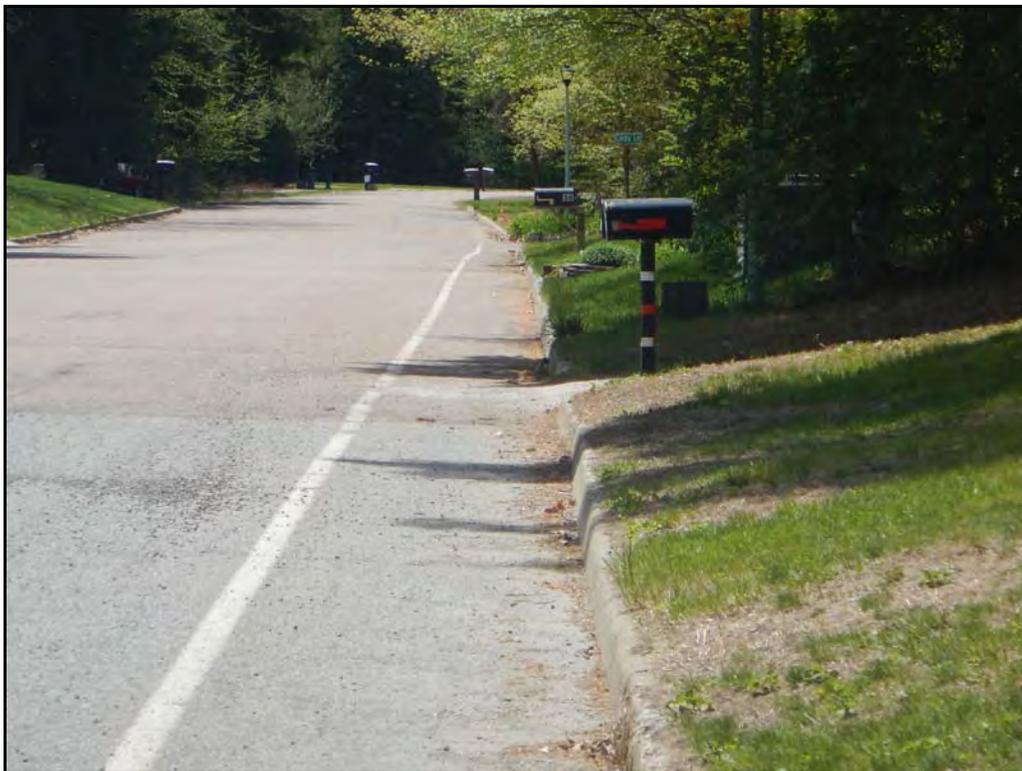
Photo shows a typical streetscape along Tanglewood Drive. View is to the west.
